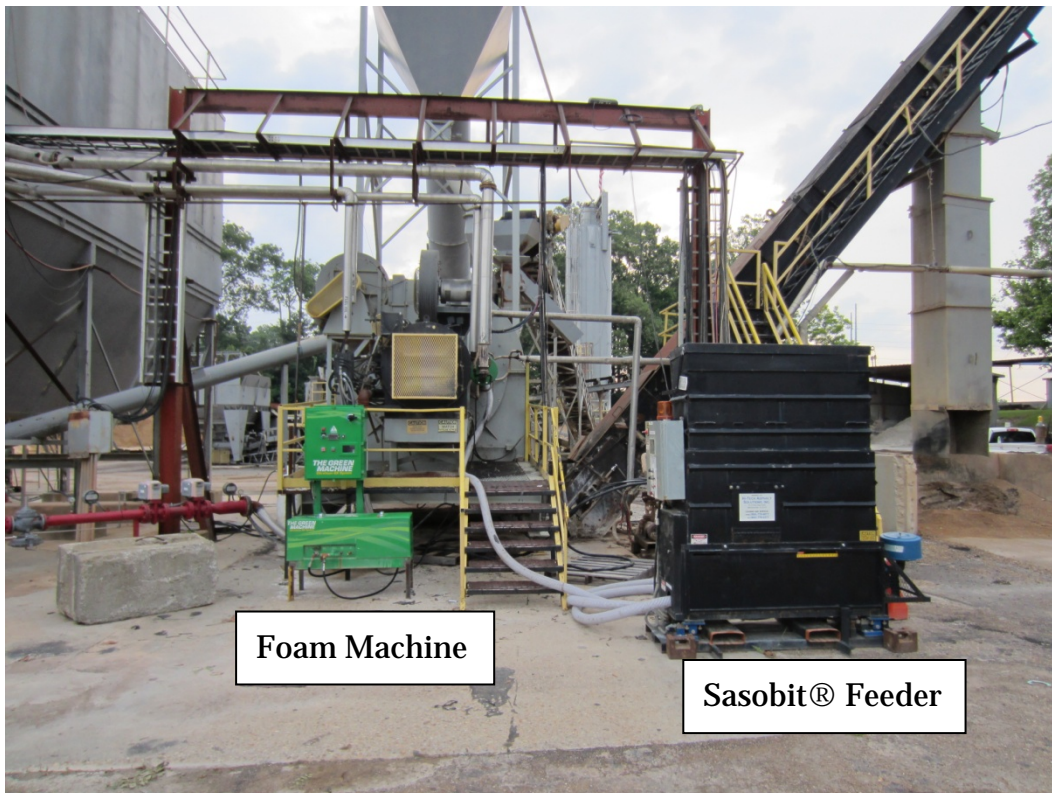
Attachments for WMA additives on asphalt mixing drum.
